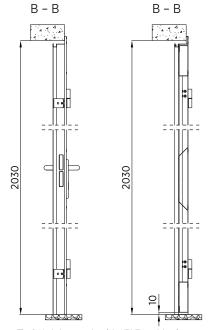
Vertical cross-section of the UTILITY steel door for technical rooms with a corner frame
